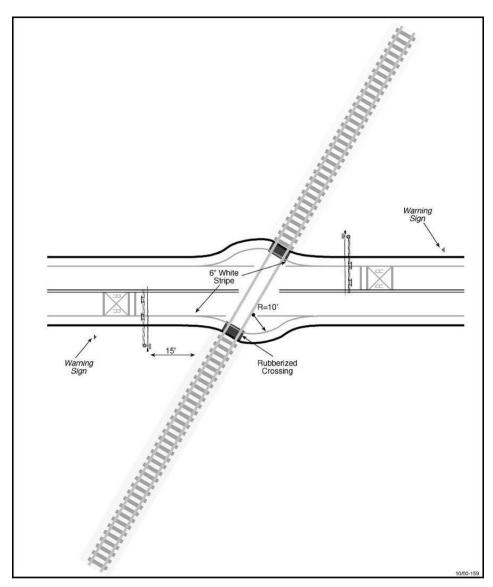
Bike Lanes Crossing at Railroad Tracks
